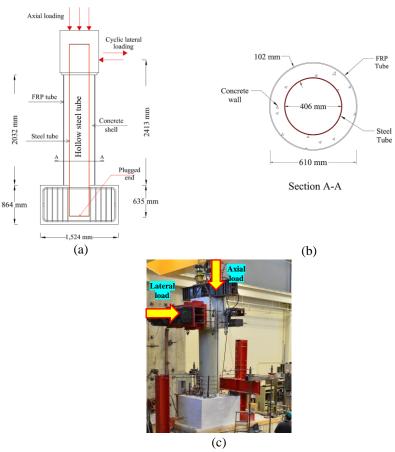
Construction layout of the column (a) Elevation; (b) column crosssection; (c) HC-FCS column perior to the test
